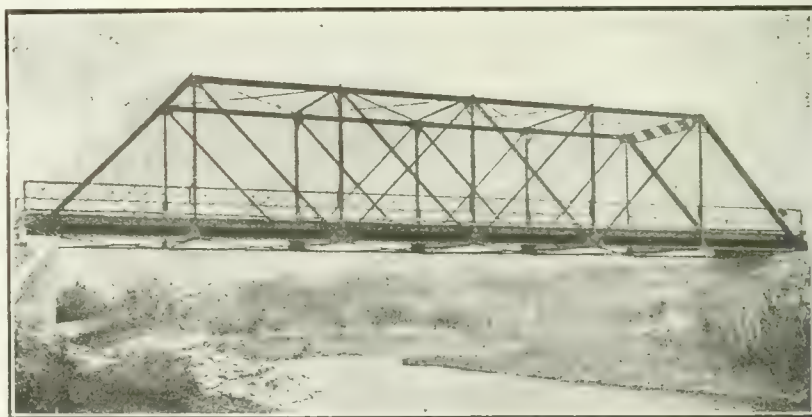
A 100-foot Steel Span on Concrete Abutments Over Eagle Creek, Sask.; Typical of the Steel Highway Bridges of the Province.
